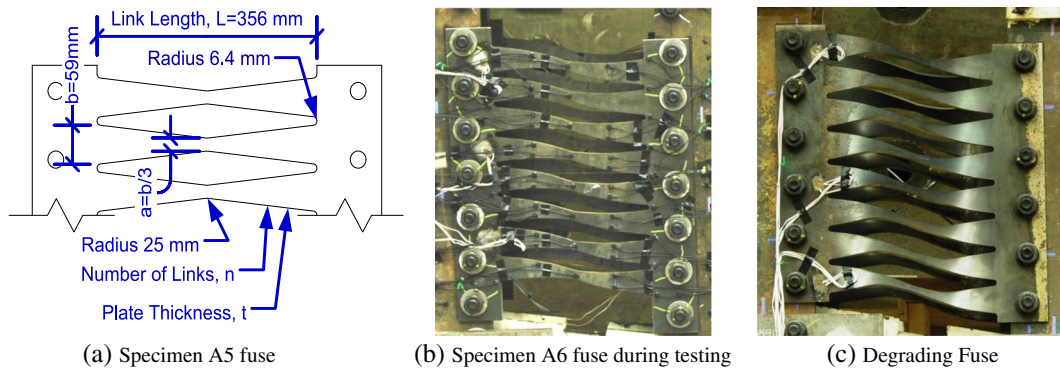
Fuse geometry and deformed shape of (a) Specimen A5 fuse – geometry of fuse links and (b) Specimen A6 fuse during testing – nondegrading and degrading fuses.
